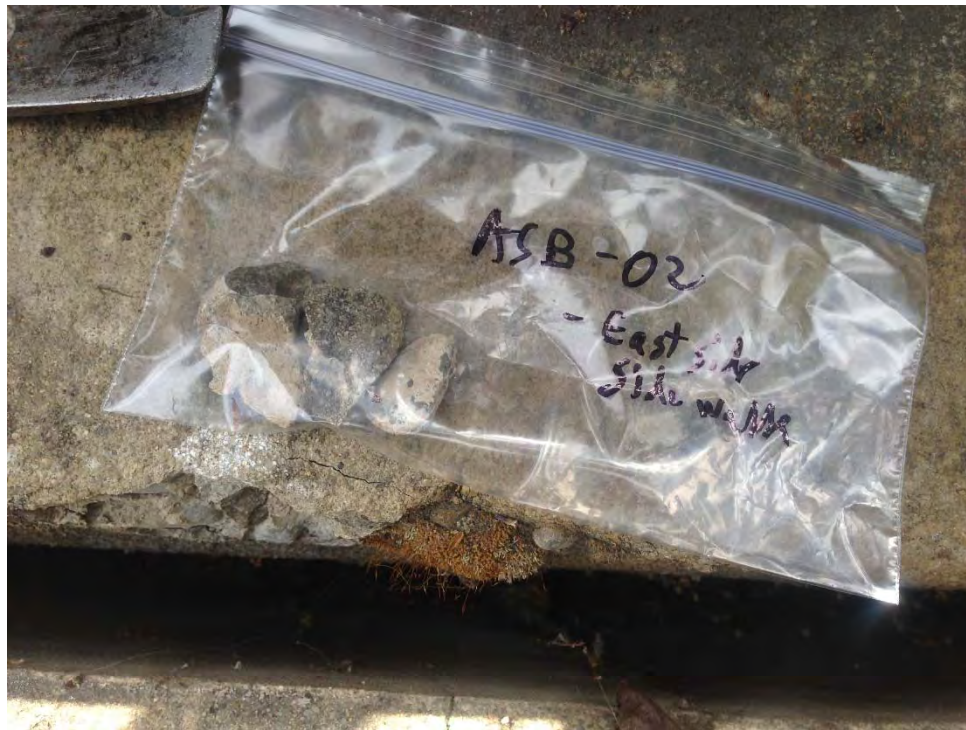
Sample ASB-02 taken from concrete above the stormwater drain on the east side of the bridge
